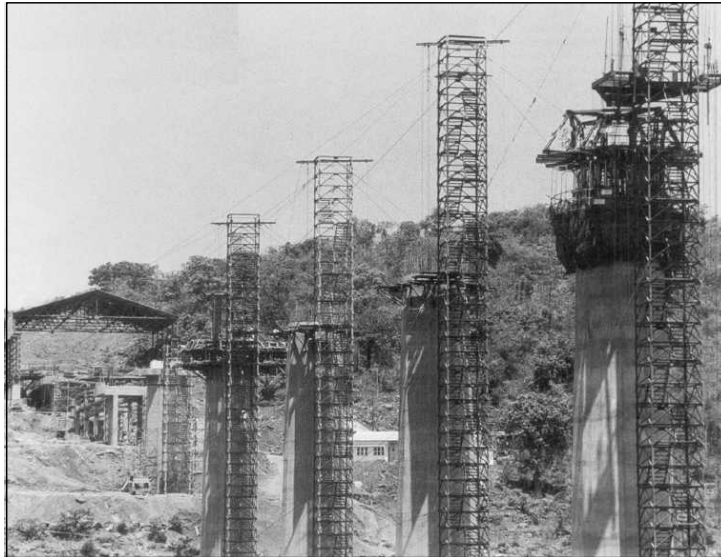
Slipforming of Octagonal Shaped RCC Bridge Piers in Progress for the Panvel River Viaduct at Ratnagiri.
